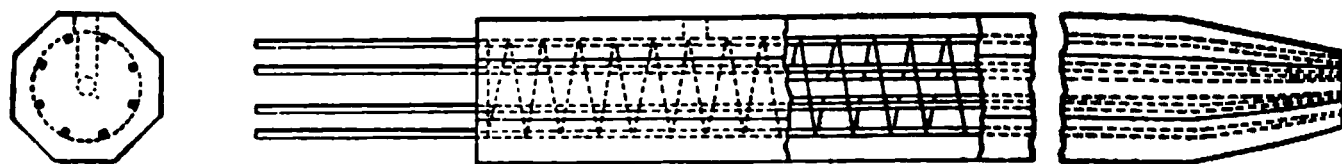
Details of reinforced concrete pile, Oakland Harbor.
